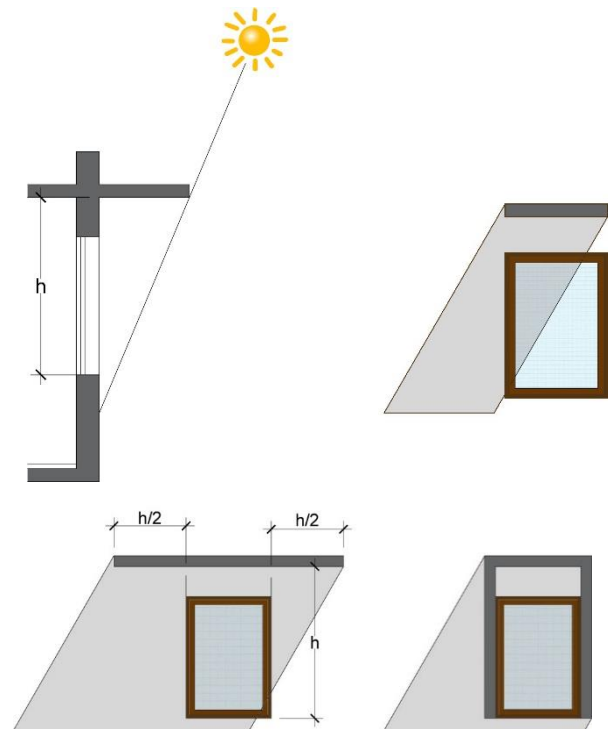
Guideline for designing effective horizontal shading for windows on south façade. Image adapted from: The Carbon Neutral Design Project (11)
